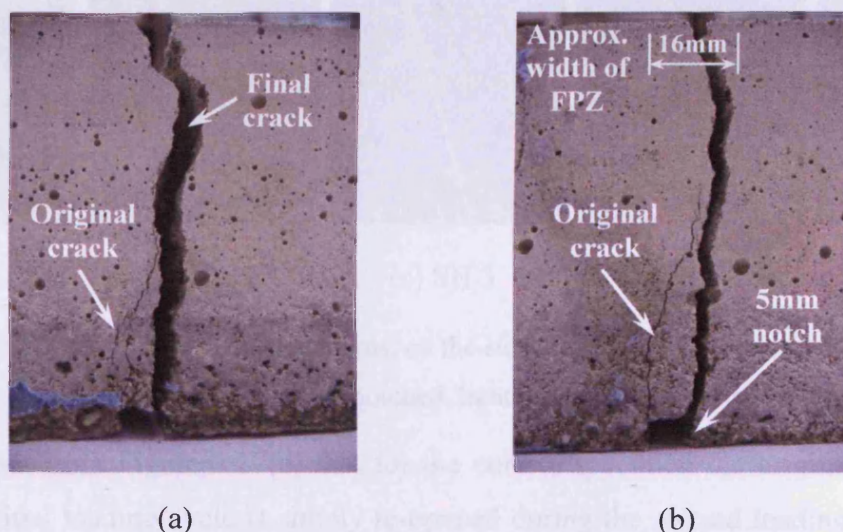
Original and final crack patterns on the side face of (a) SH beam 2, and (b) SH beam 3, for the first experimental round on notched, lightly reinforced beams
